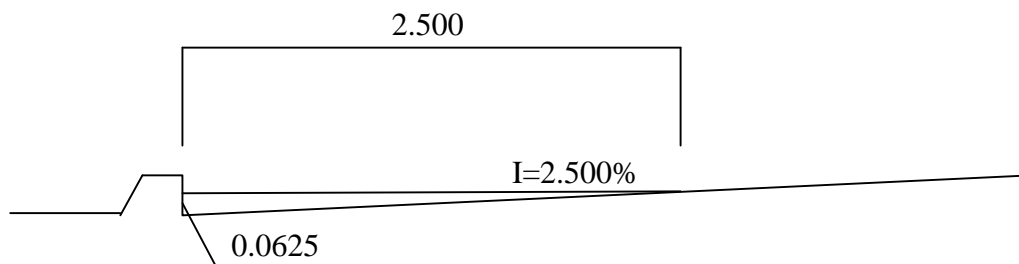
Section of Ramp Drainage Facility (Asphalt Concrete Curb)
